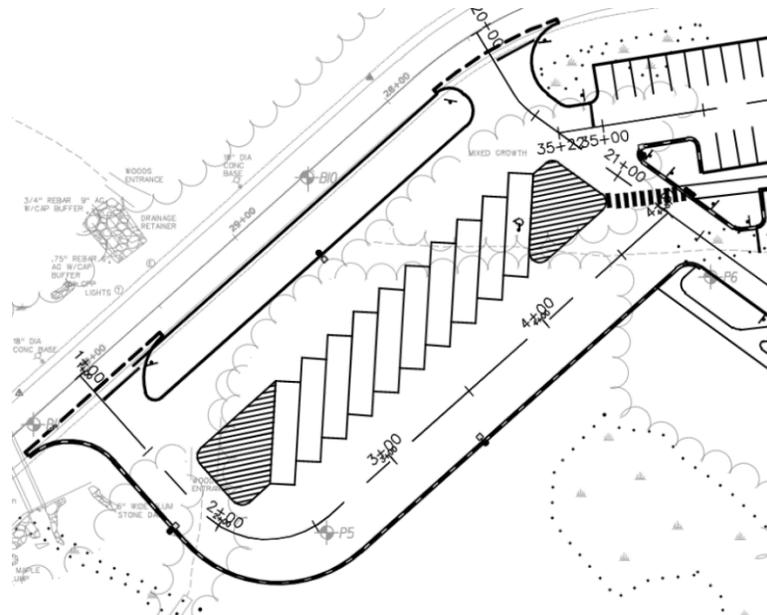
Proposed Layout of Western Parking Area at Acadia Gateway Center
